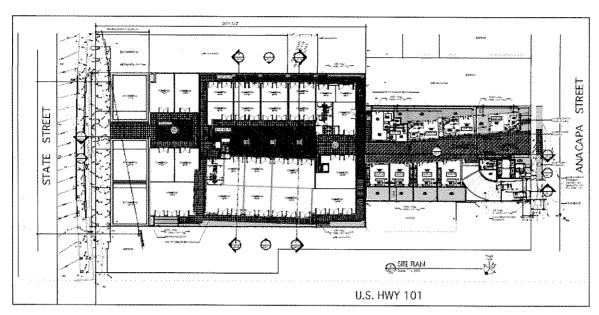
Revised First Floor / Site Plan Showing Roadways and Existing Intervening Structures
